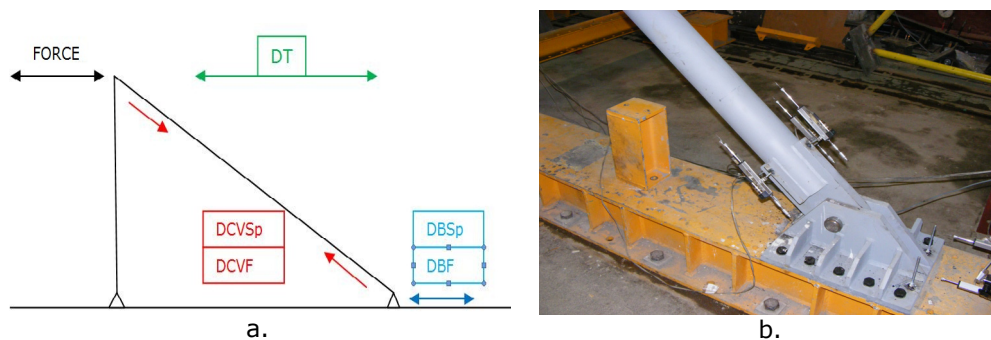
a) Measurement devices positioning scheme; b) Positioning of measuring devices on the CHS section brace test specimen
